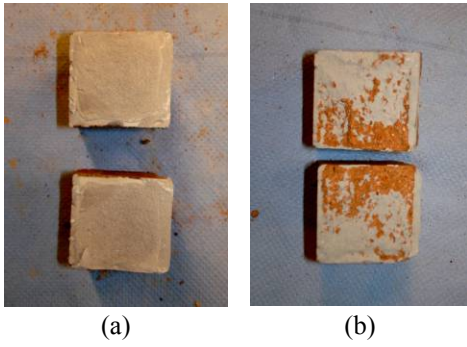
Failure mode of the repaired earthen beams: (a) failure of the grout and (b) failure of the grout-earthen beam interface.
